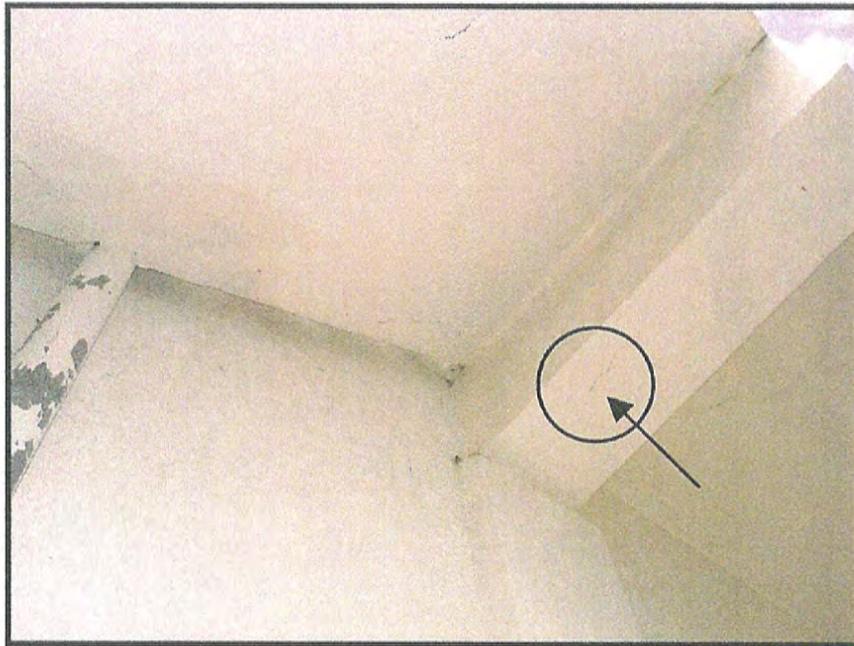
Delaminations along bottom face of cantilevered beam support at the top of landing of the North exterior stair.
